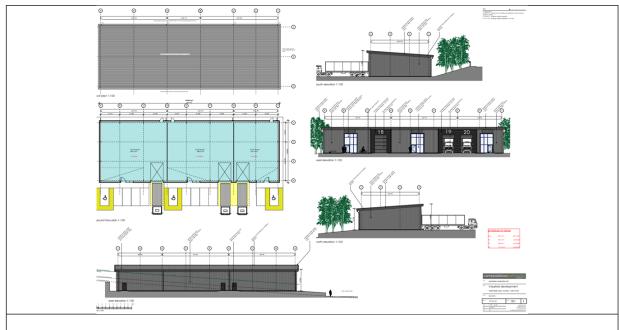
Proposed Elevations and Floor Plans (Rev 4)
